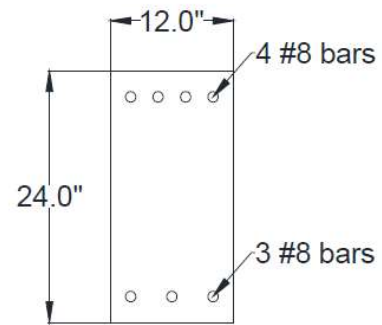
Layout of column cross-sections in original building (Stinger, 2011)
